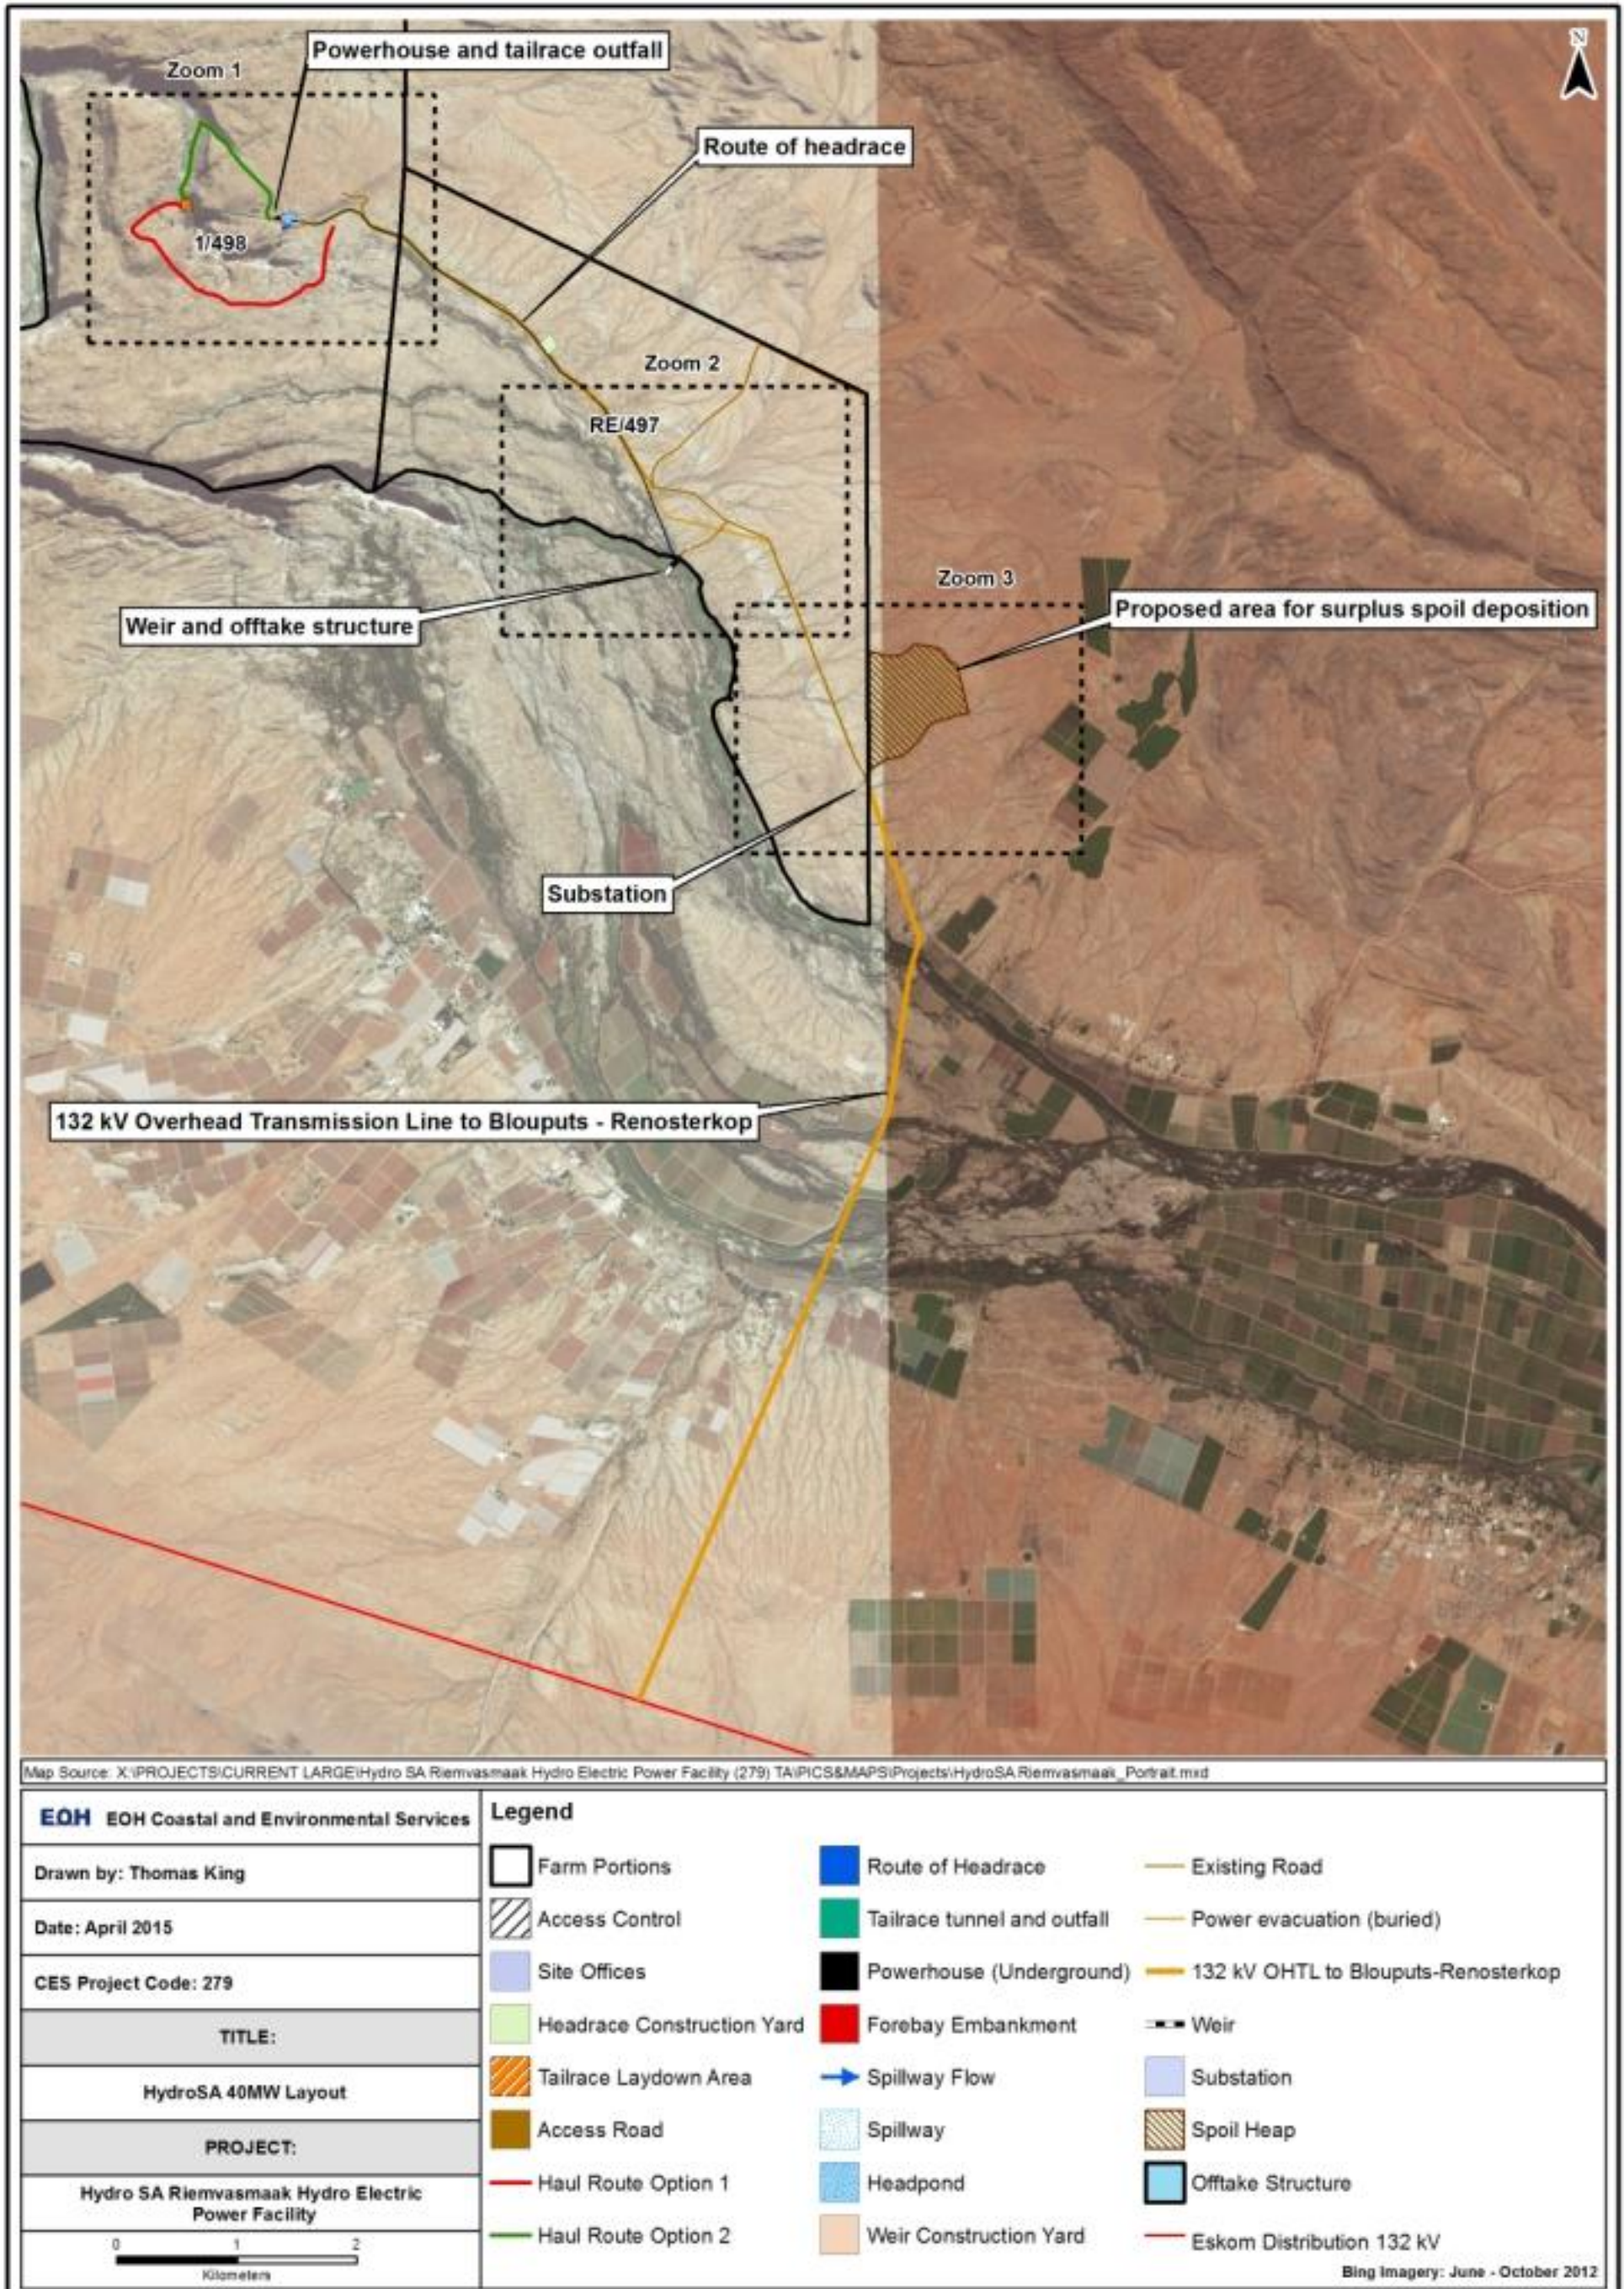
General layout of project infrastructure from diversion weir to tailrace outfall
